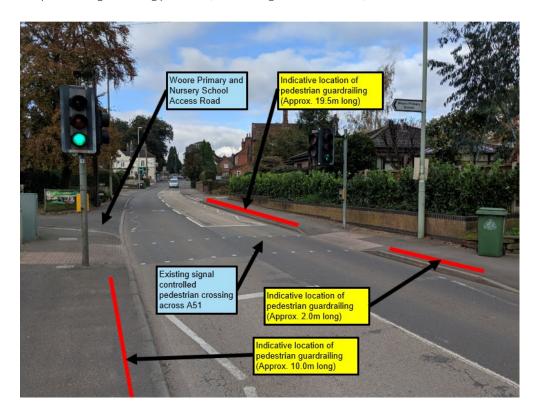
Potential pedestrian guardrailing provision (View looking South on the A51)
